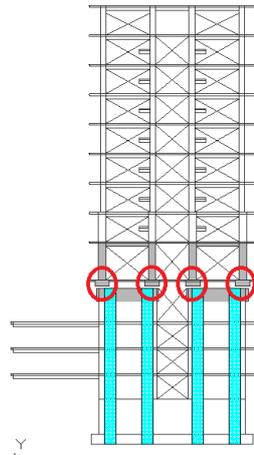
Elevation of Nueva La Dehesa Building, Santiago, Chile.
